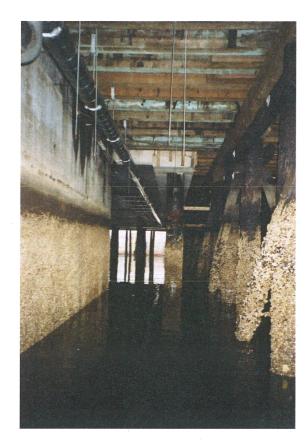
CONCRETE-FACED TIMBER CRIB NEXT TO TIMBER JETTY PILINGS
